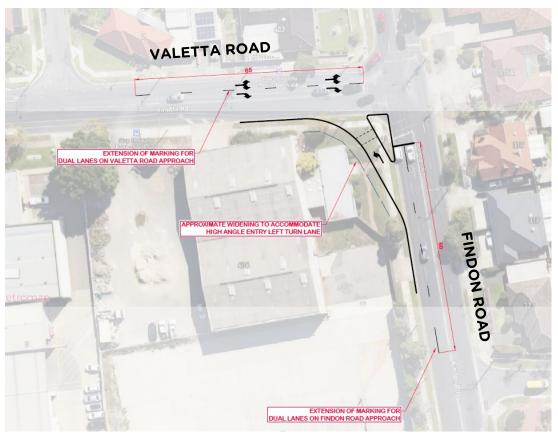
Potential upgrade to address additional volumes associated with the rezoning/redevelopment (subject to detailed design and relevant approvals)
